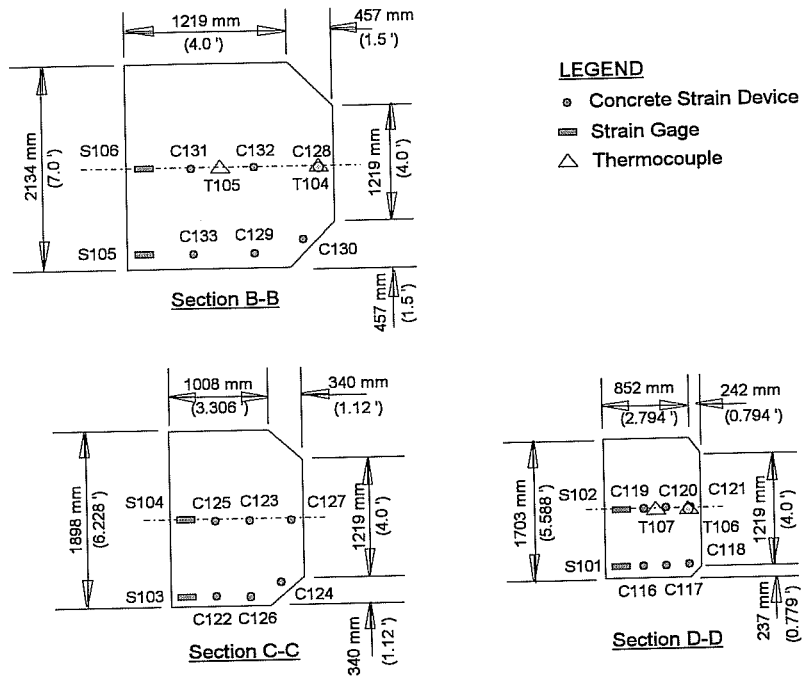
Strain Gage and Concrete Strain Device Layout: Sections
